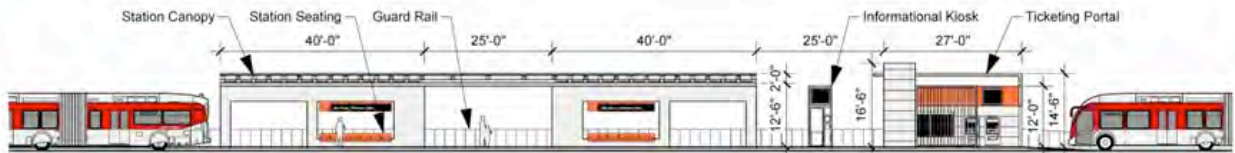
Illustrative Design Details for Median-Running BRT Alternative
